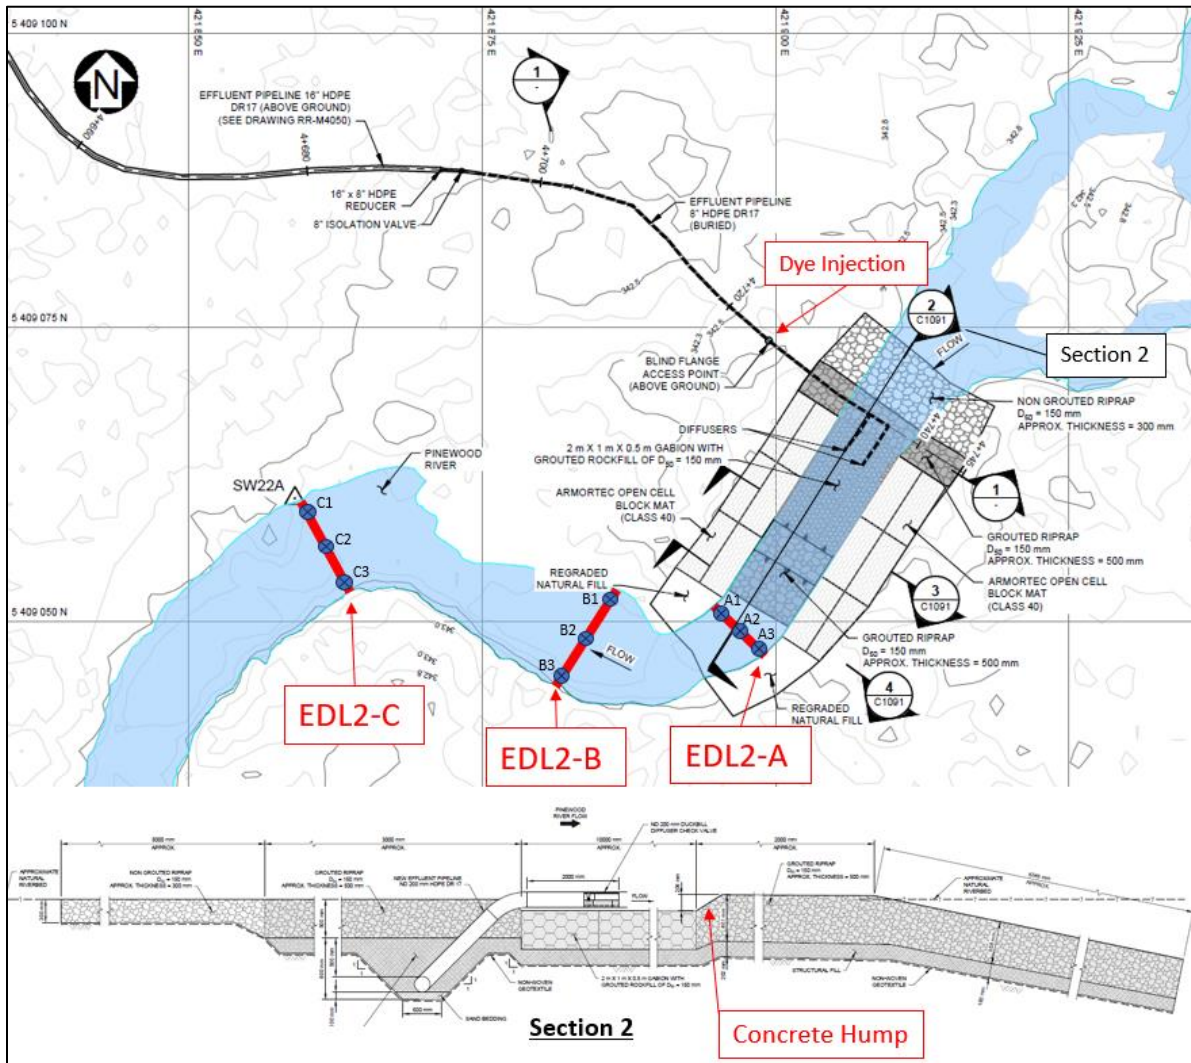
EDL 2 Plan View and Long Section of the As-Built Drawings with Mixing Study Transect Locations (Source: Drawings RR-C1090 and RR-C1091, KP, 2020c)
